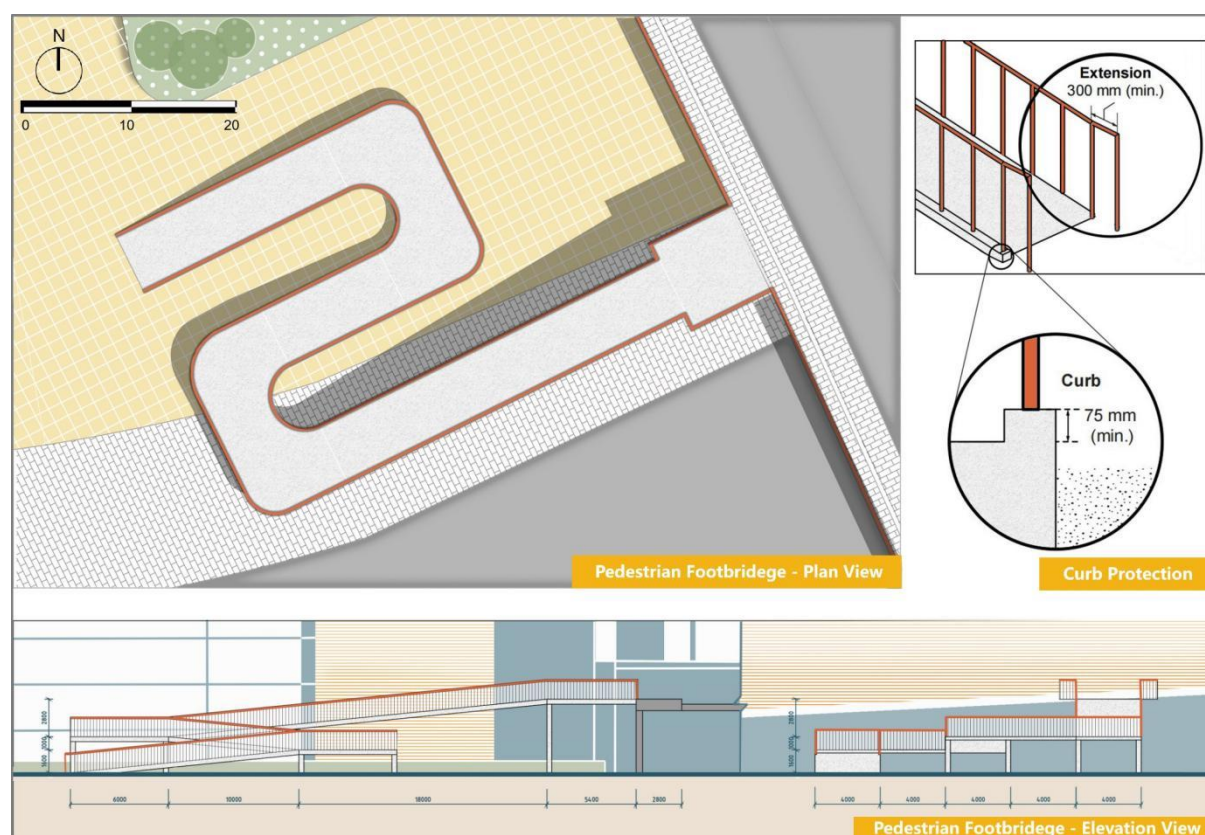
Plan, elevation and details of pedestrian footbridge
